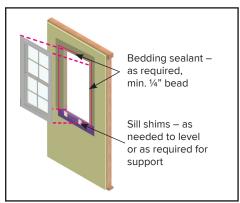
Apply sill shims and bedding sealant, set window into center of opening, and temporarily secure with flange nail.
